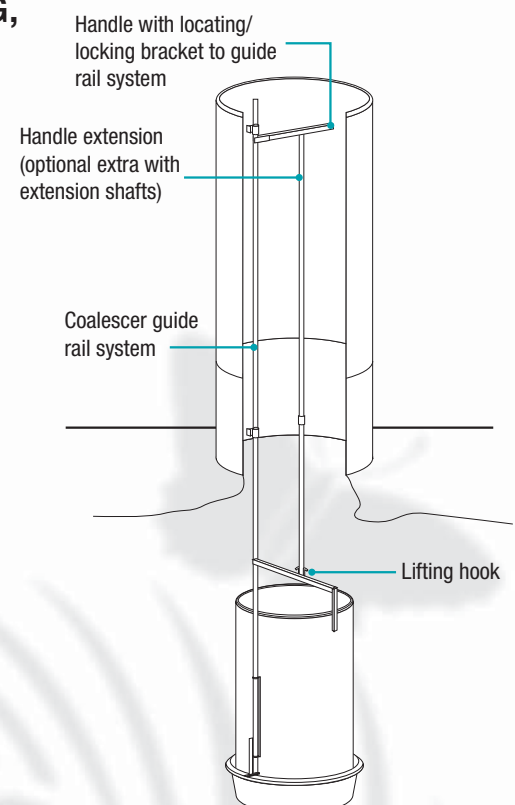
SPEL coalescer unit guide rail system/lifting, locating and locking system
